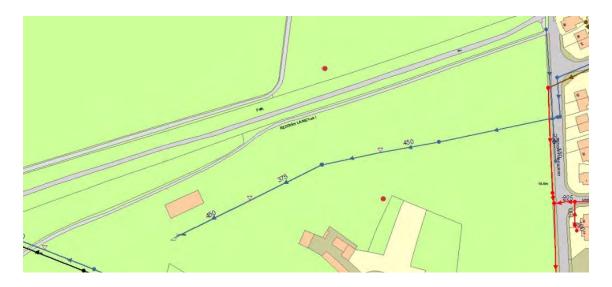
Surface water drain crossing the site shown as blue line. Existing foul sewer shown as red line – source United Utilities searches.
